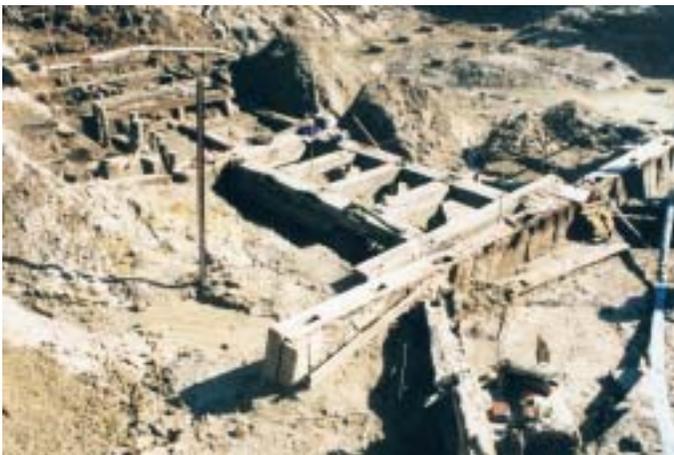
View of "second" penstock of mortised and wood-peg crossbeams. Wing wall in foreground to right. Looking Southeast.
